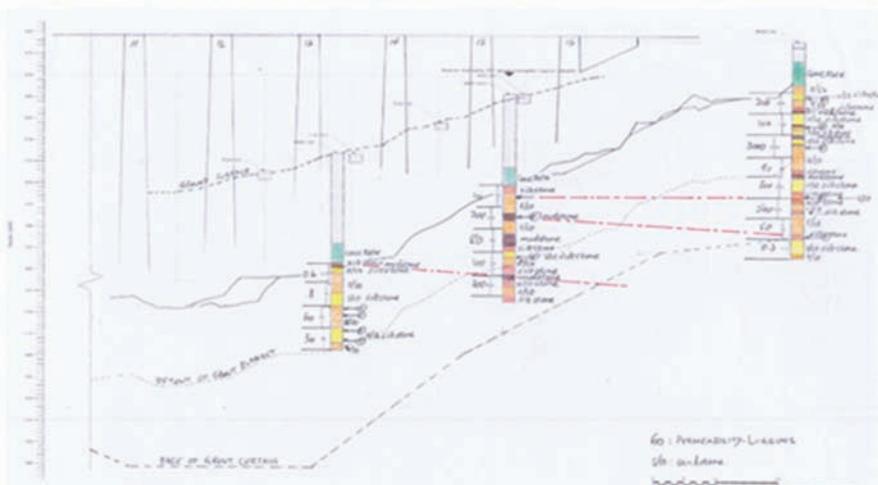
Wimbleball Dam and its foundation stratigraphy.
